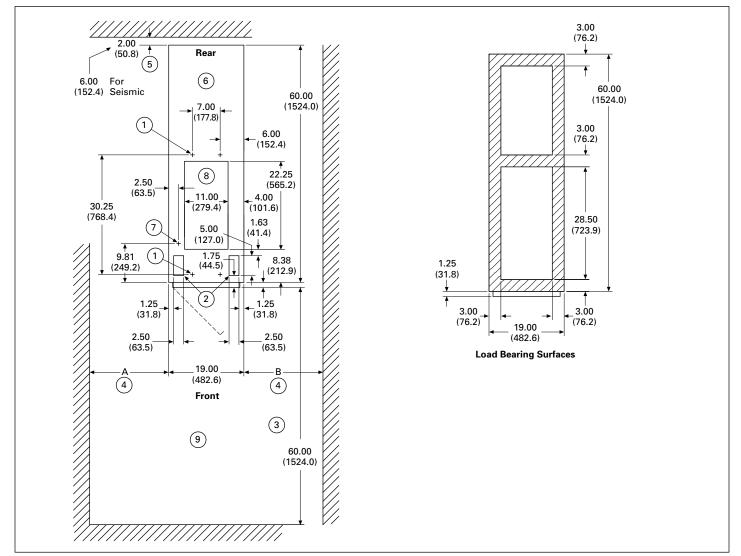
MEF 19.00-Inch (482.6 mm) Wide Pull Section Floor Plan
